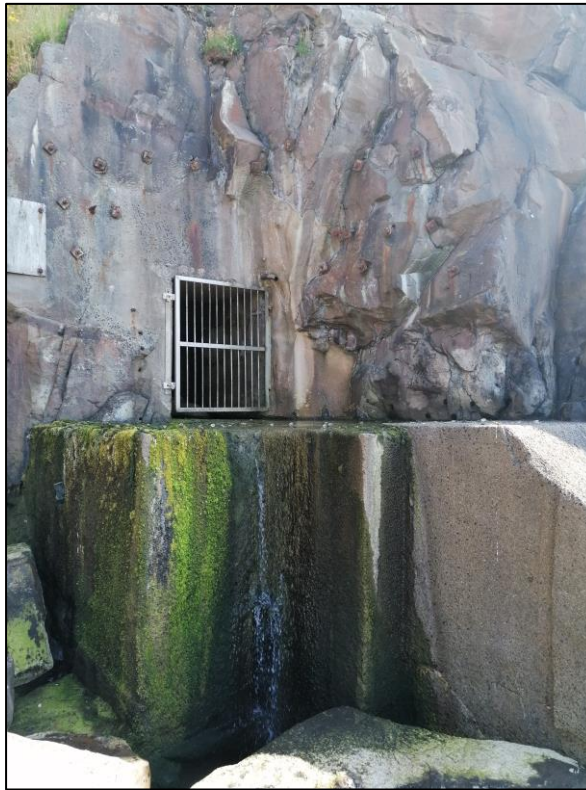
Northern Discharge Pipe – Sea Outfall (I)
